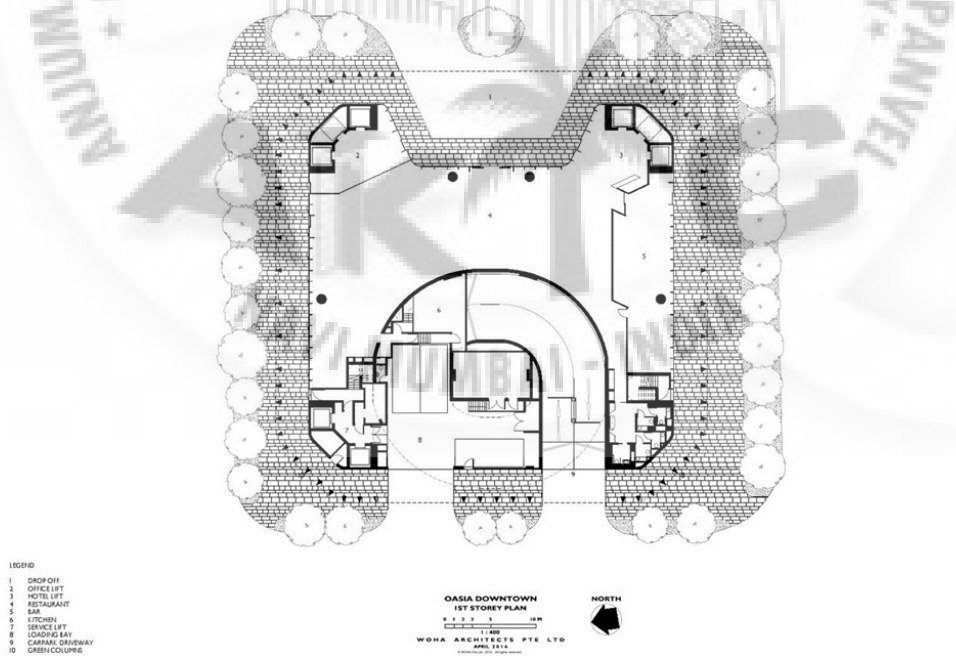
Oasia Hotel Downtown ground floor plan (Source – Arcdaily)
